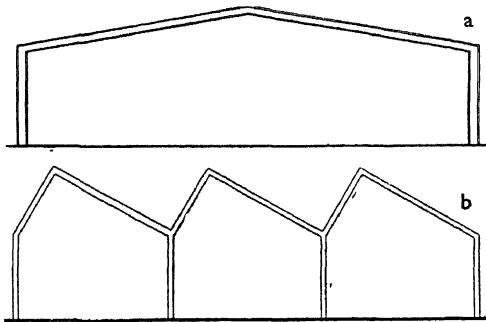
a, single-span symmetrical rigid frame roof; b, multi-span "north-light" rigid frame roof
